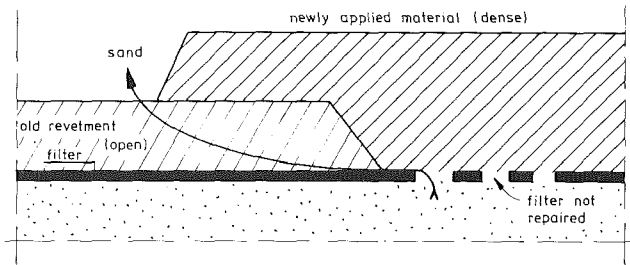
Loss of sand from under a poorly repaired stone asphalt revetment.
